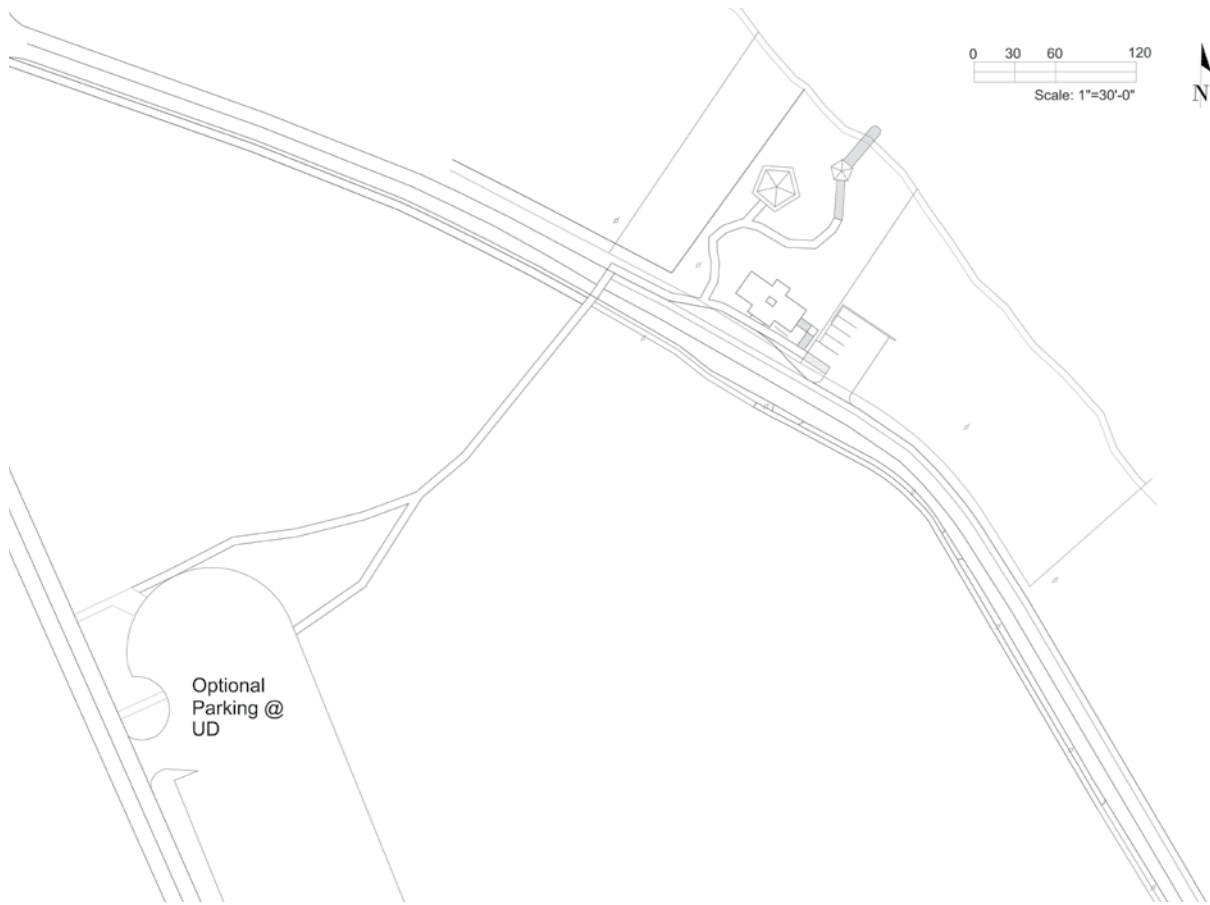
Final chosen parking design plan and proposed connection to UD parking lot for overflow.
